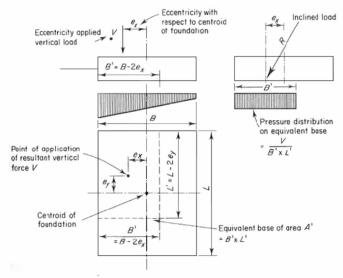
Effective footing dimensions for rectangular foundations (Meyerhof 1953).
